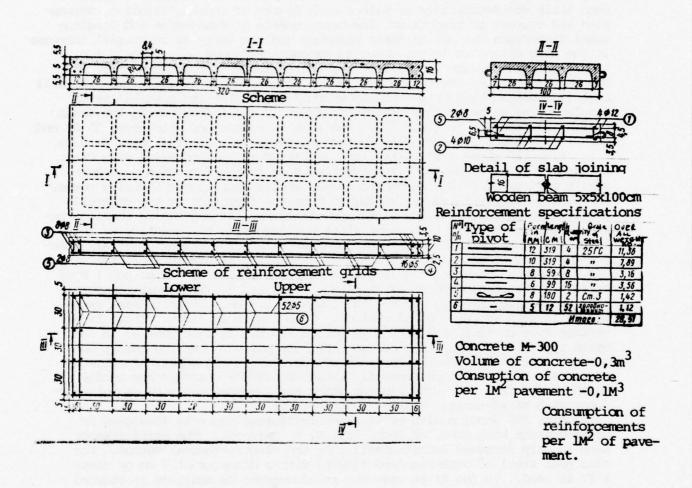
Reinforced concrete slab intended for manufacture by continuous-rolling mills.
